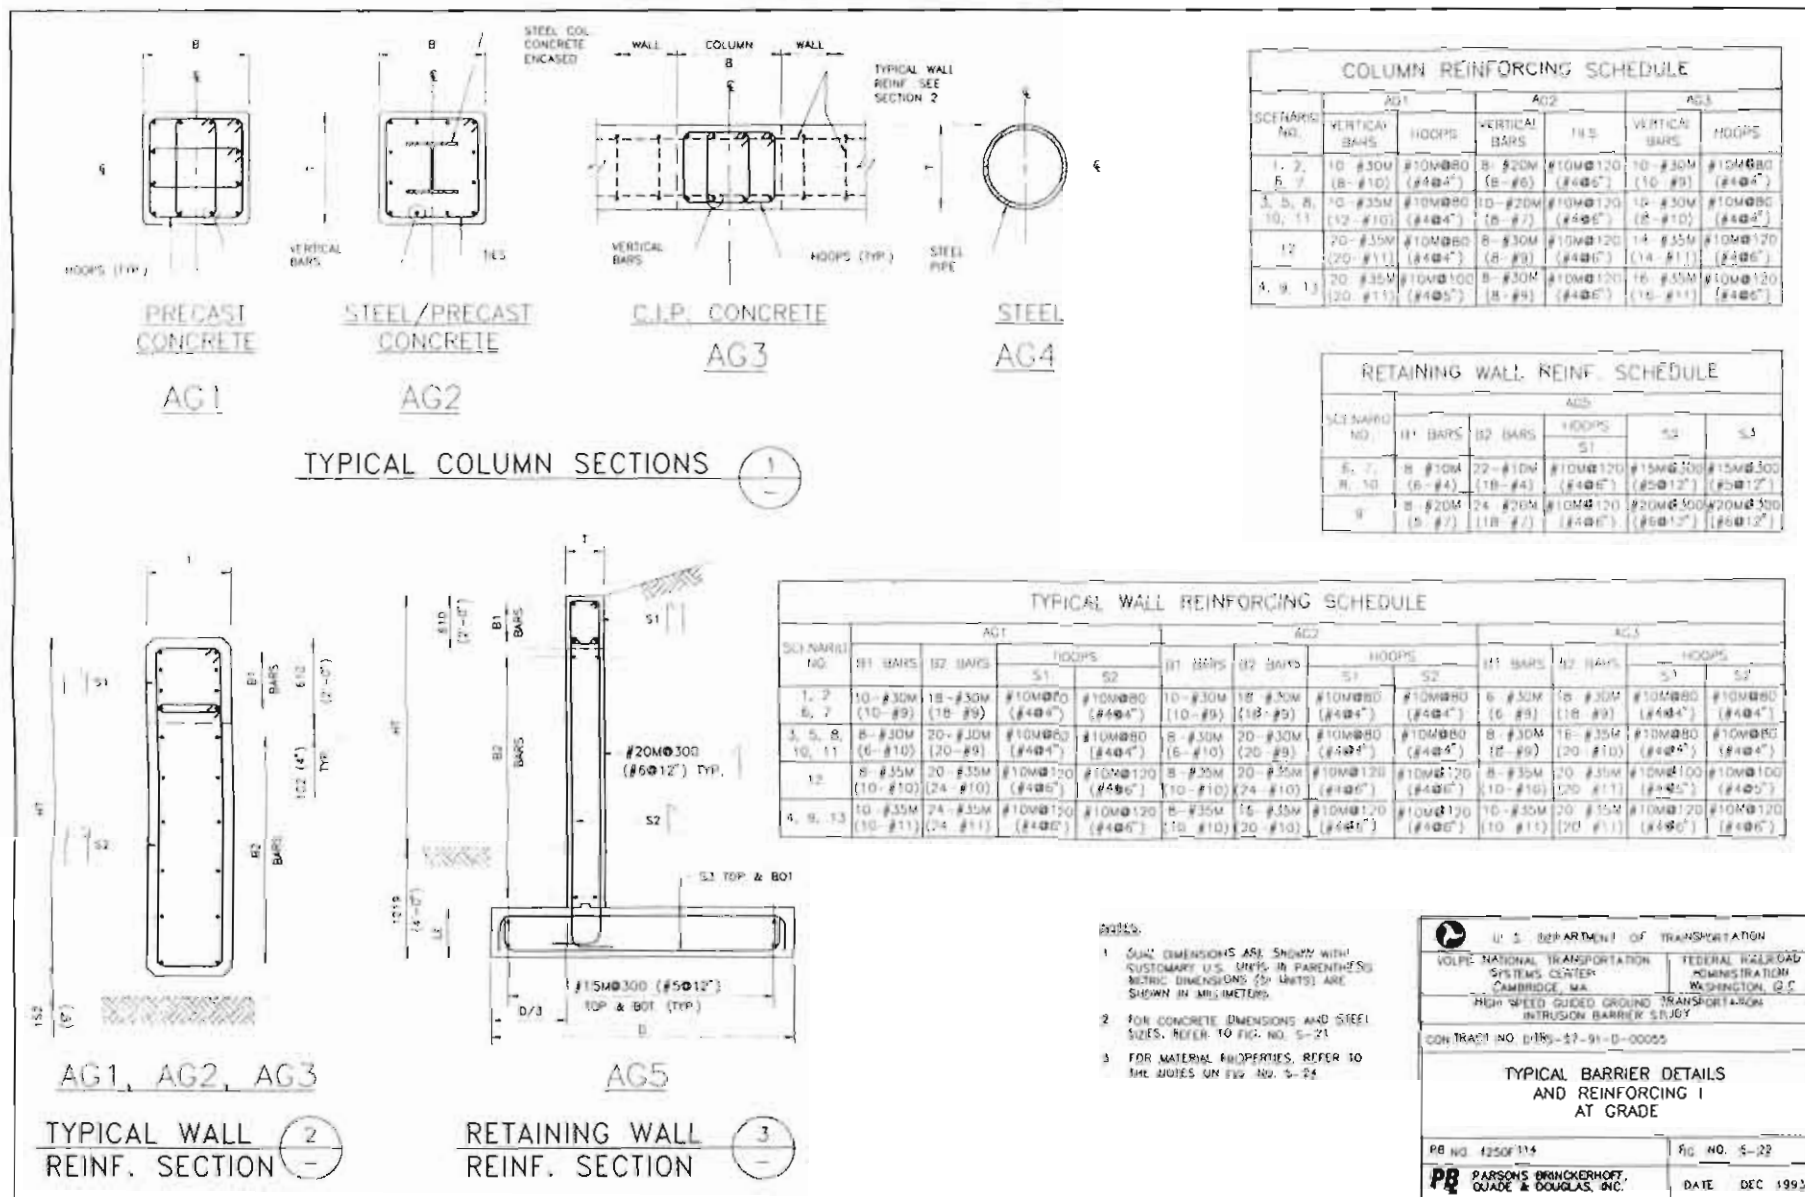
TYPICAL BARRIER DETAILS AND REINFORCING AT GRADE (I)
